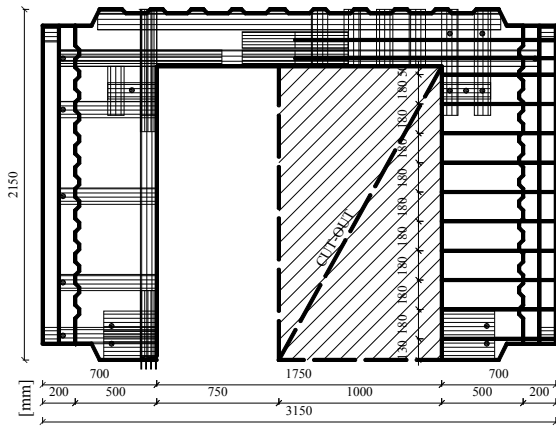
The strengthening layout of the precast reinforced concrete wall panel with large door opening [3].
